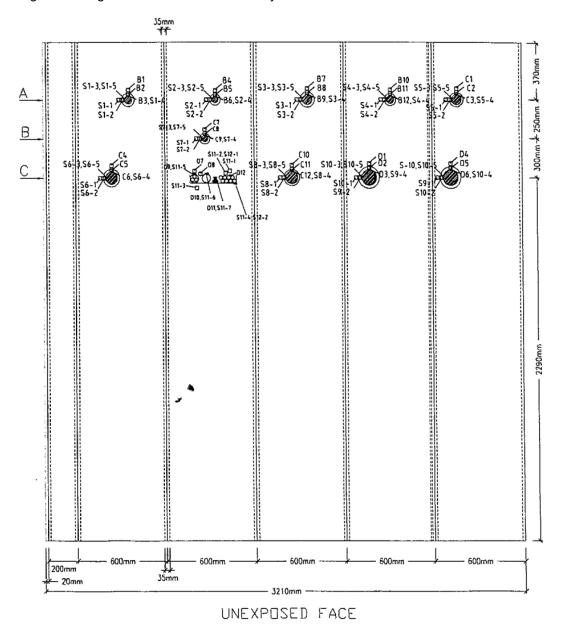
Test specimen (unexposed side) and cut hole locations as shown in WFRA F91731.1 – dimensions in mm
